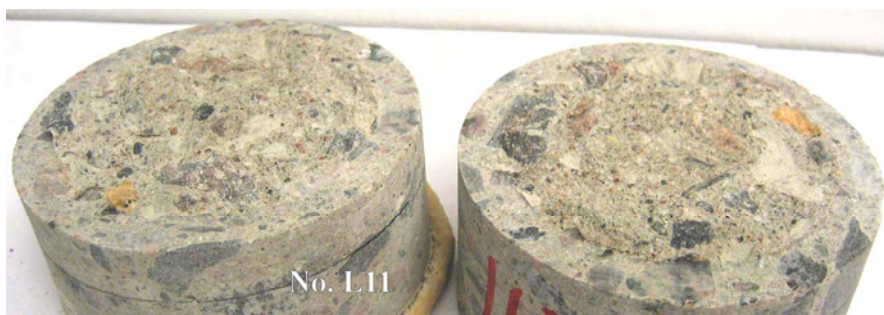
Photograph showing the failure surface for test No. L11 after fatigue test.
